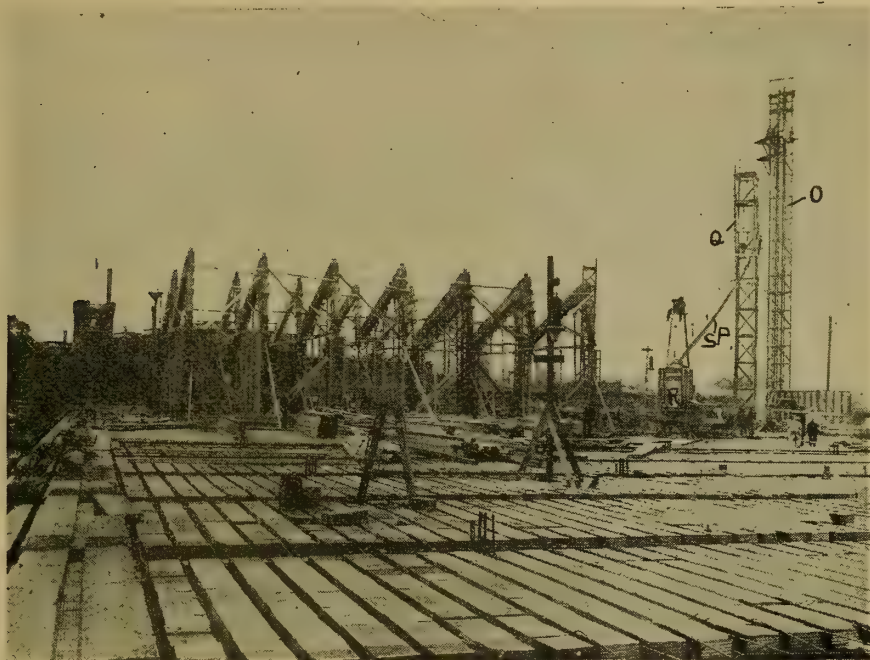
General View of New Concrete Mill Showing Floor Construction and Roof Frames.
